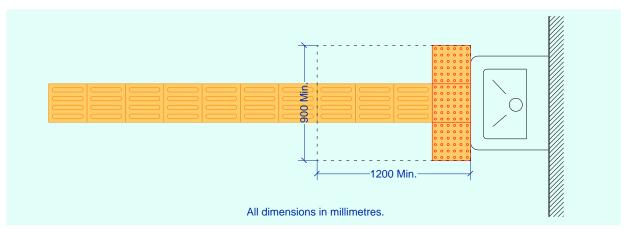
Clear floor space for freestanding or built-in drinking water unit not having clear space under the unit
